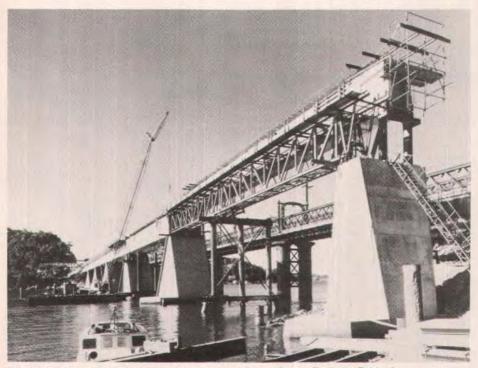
Falsework truss and temporary steel bent (Como Railway Bridge).
